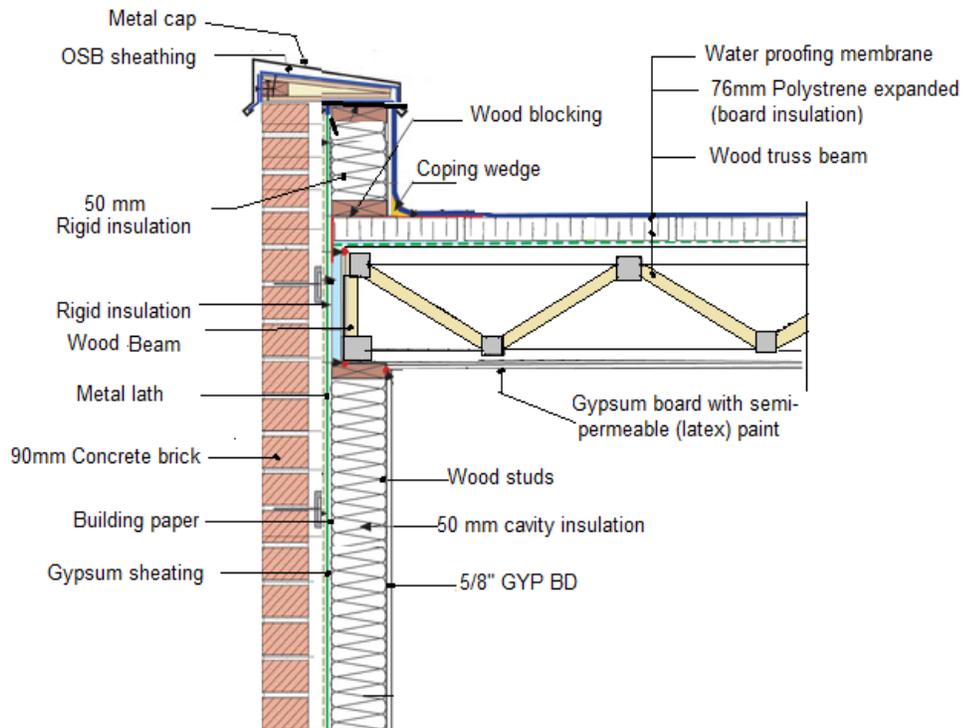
Detailed section for wood alternative with concrete brick (WC)
